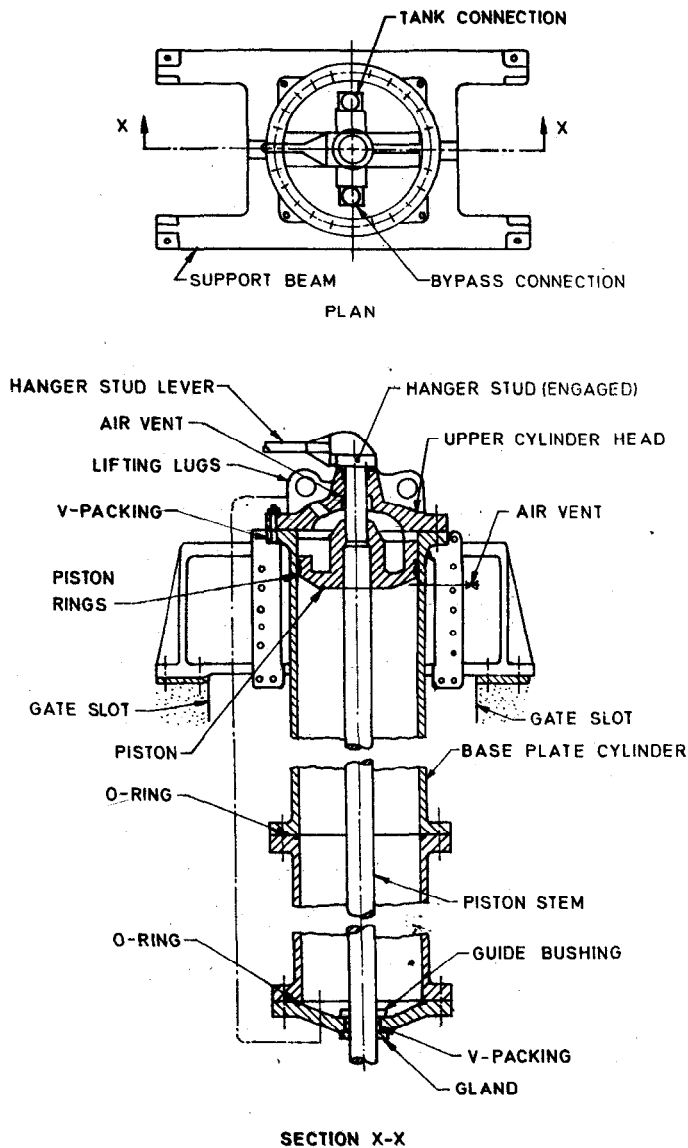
TYPICAL ARRANGEMENT OF HYDRAULIC HOIST FOR AN INTAKE GATE
